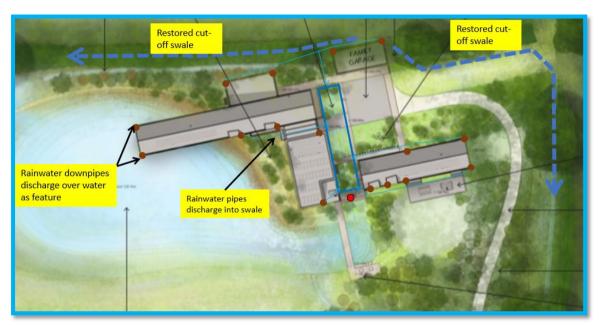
Drainage design showing rainwater pipes, connection and discharges to swale/rill.
